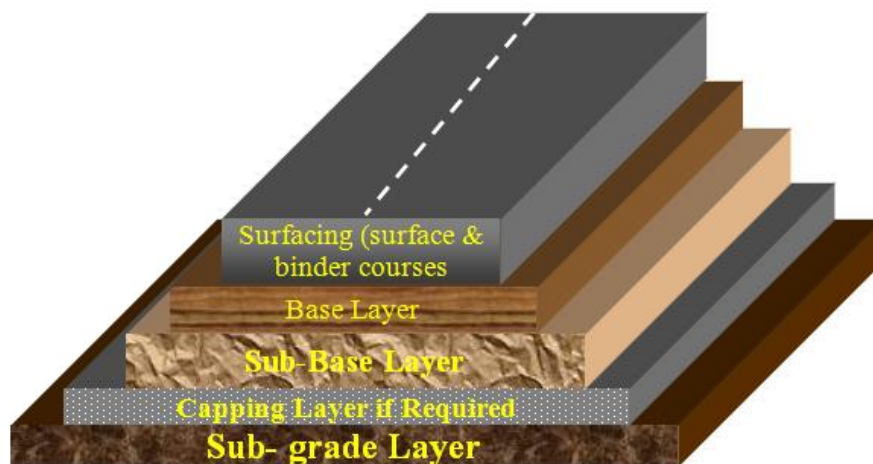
Typical flexible pavement structure (Abd 2011)
